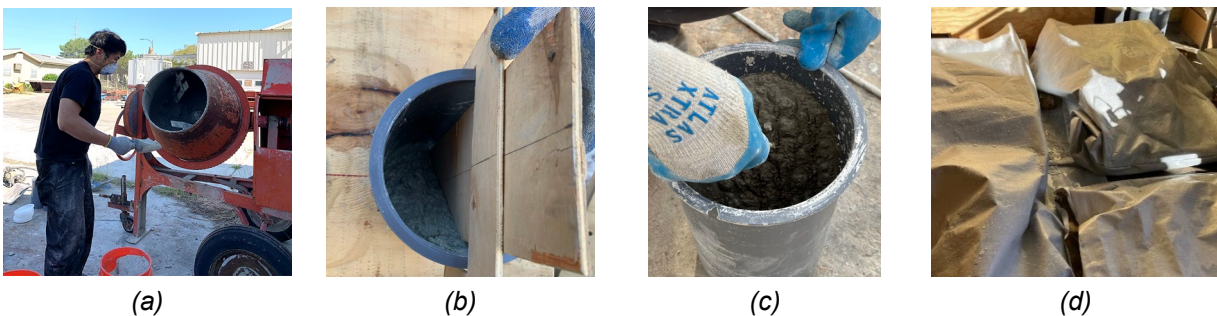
Casting procedure for small-scale slant shear specimens (a) Concrete mixing (b) Wood gauge fabricating (c) Interface roughening (d) Curing with burlap
